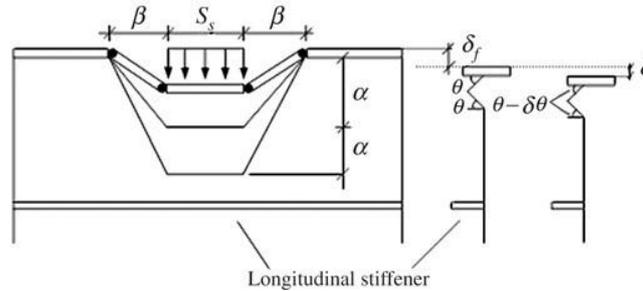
Modified collapse mechanism for longitudinally stiffened girder (Graciano 2005)
